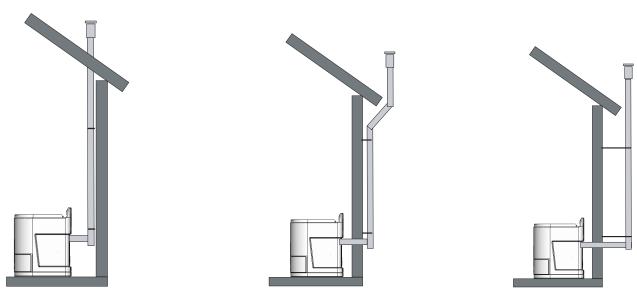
LAYOUT OF VENT INSTALLATION
